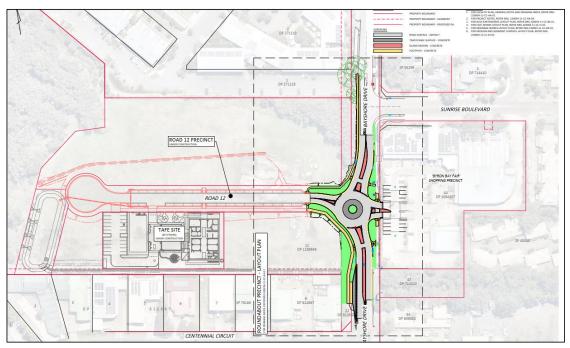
Proposed Stage 2 Works – New Roundabout on Bayshore Drive (Source: NDC Civil Plans)
